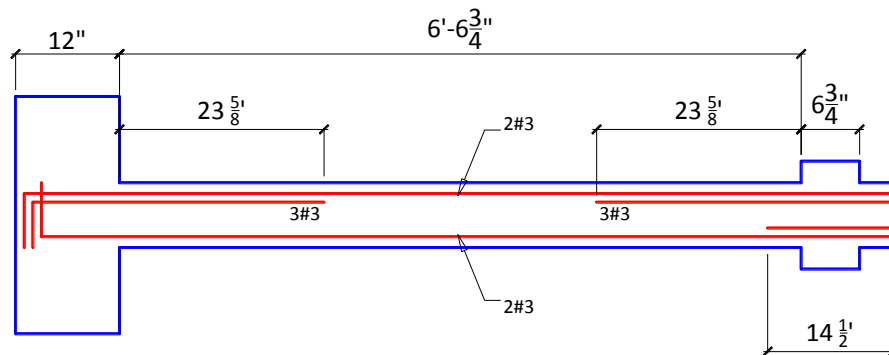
Reinforcement detailing of the experimental beam (Sasani and Kropelnicki, 2007).
